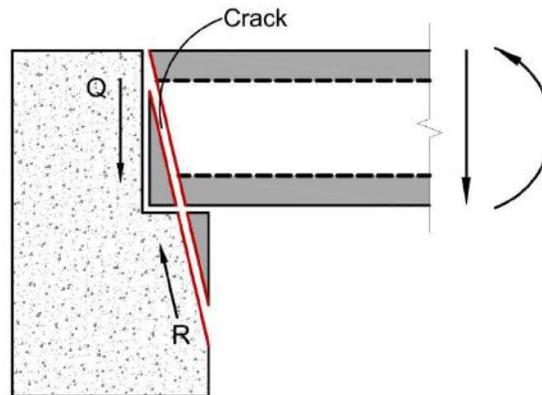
Spalling of concrete within the hollow core plank support zone (based on Fenwick, Bull, and Gardiner, 2010).
